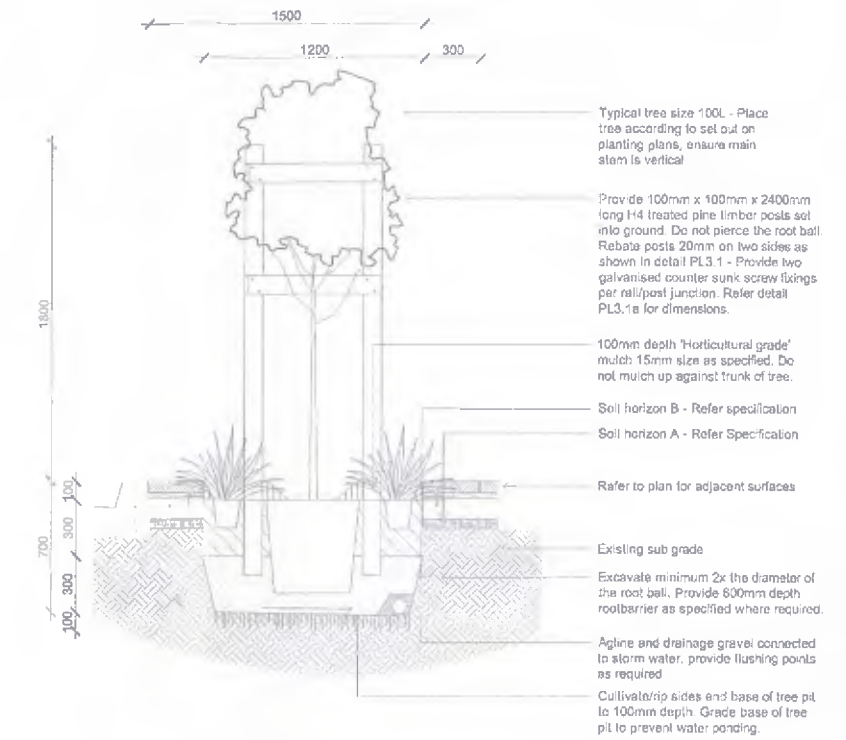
DETAIL - TREE GUARD 1200mm SIZE - TYPICAL
